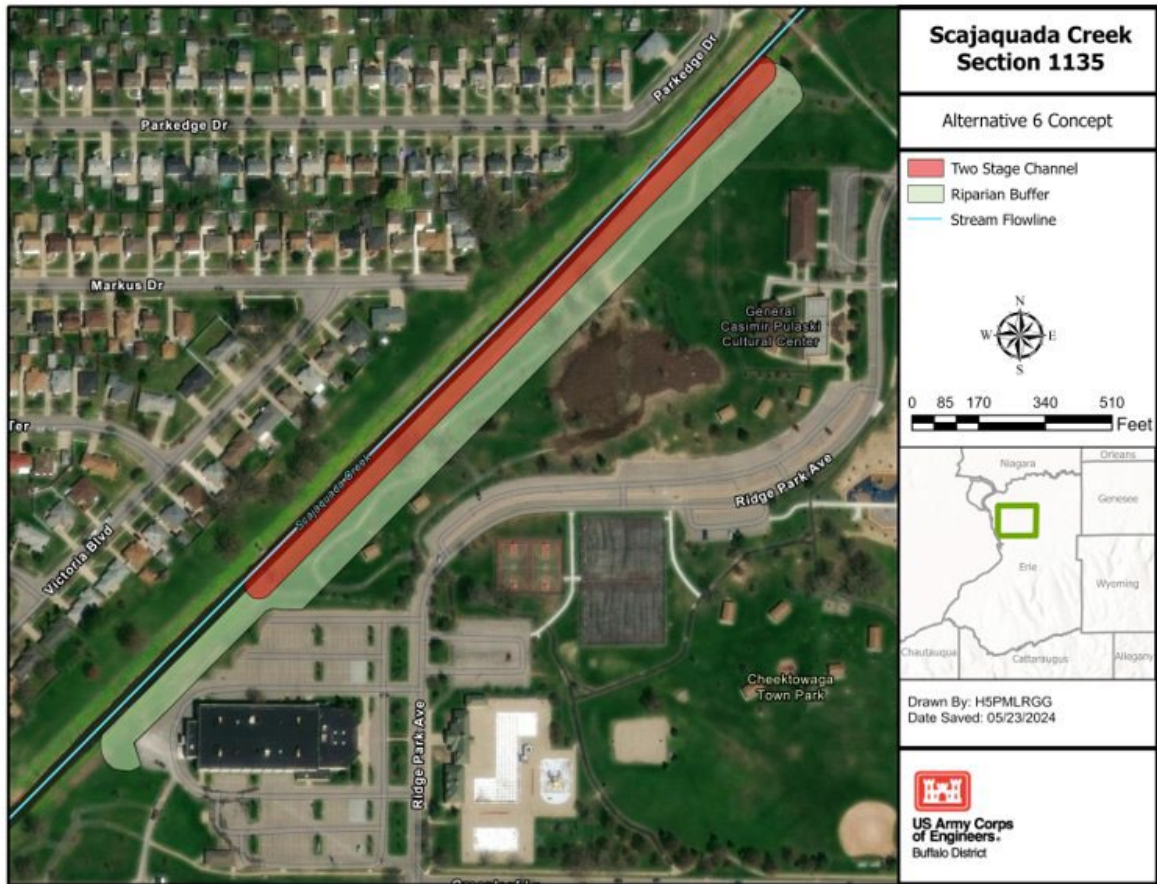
Alternative 6: Proposed site layout of the Cheektowaga Town Park Two-Stage Channel.
